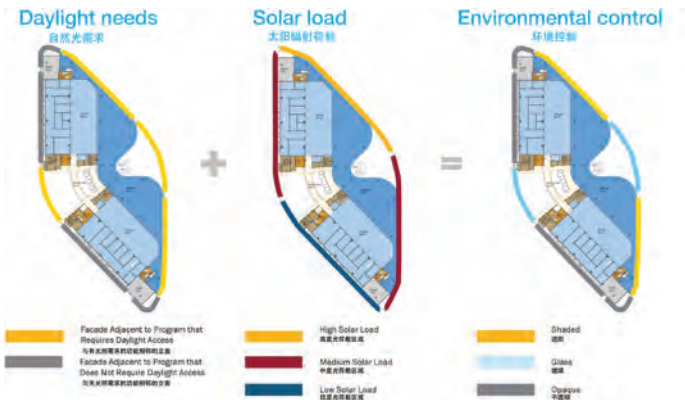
South Australian Health and Medical Research Institute: Typical floor plan illustrating façade performance requirements. (Source: Woods Bagot)
